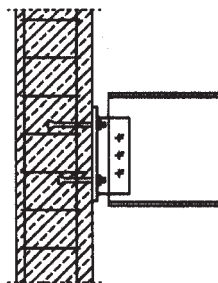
Steel beam connected to concrete wall with anchor plate and shear tab.
